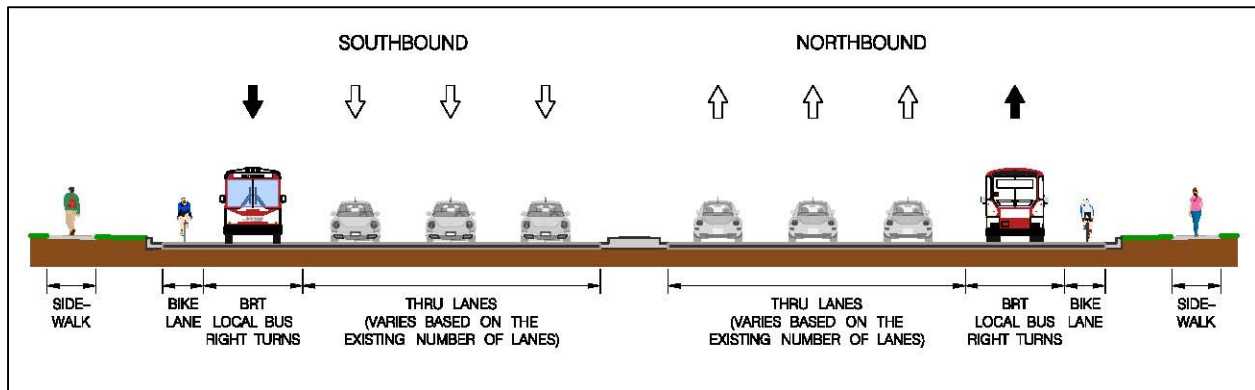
Alternative 4C - Section 1: AM Peak Period – Pooks Hill Road to Jones Bridge Road
